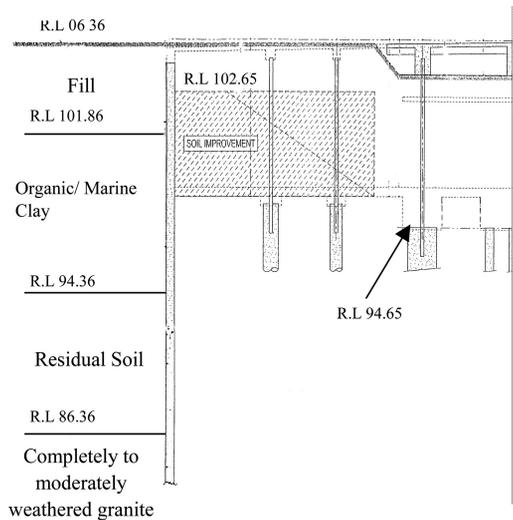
Use of deep soil mixing to provide an improved berm, HDB Centre at Toa Payoh.
